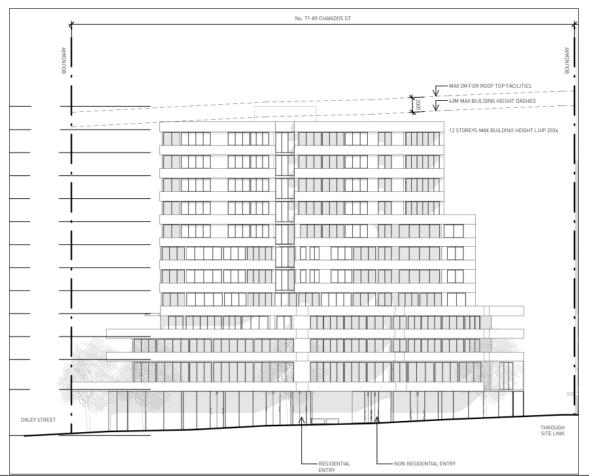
Northern (Chandos Street) Elevation Plan, as exhibited (Applicant's amended Architectural Drawings, p. 19)
